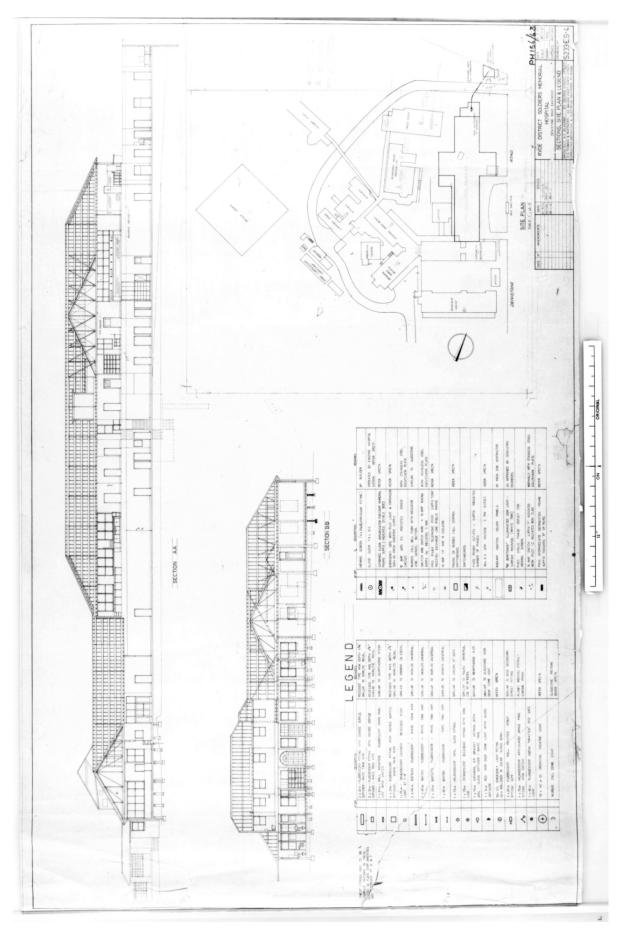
Elevation plan of the Patients Services Building (Building 6) Source: State Records Authority, NRS-21554-12-7-PH156-63
